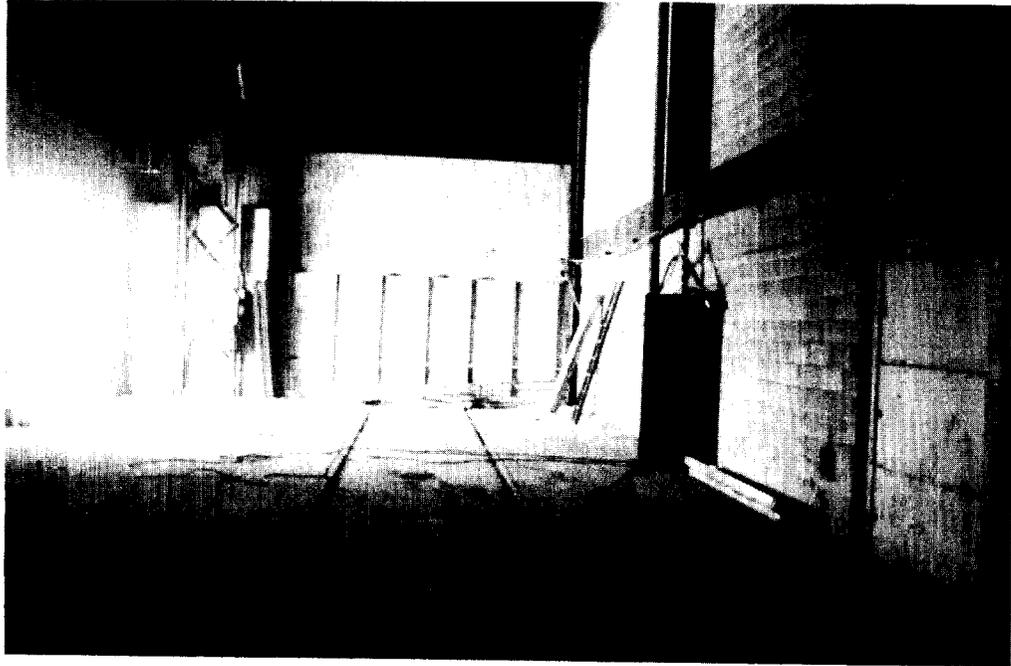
View looking northeast inside New Betatron Building with main entrance at left of photograph.
